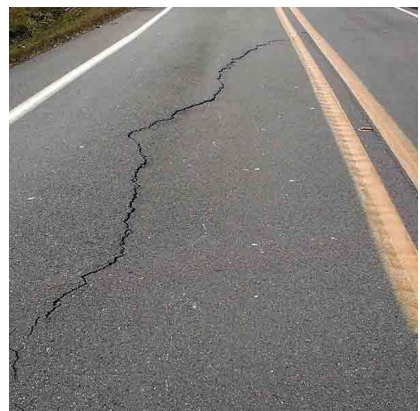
EXAMPLE OF LONGITUDINAL CRACKING
